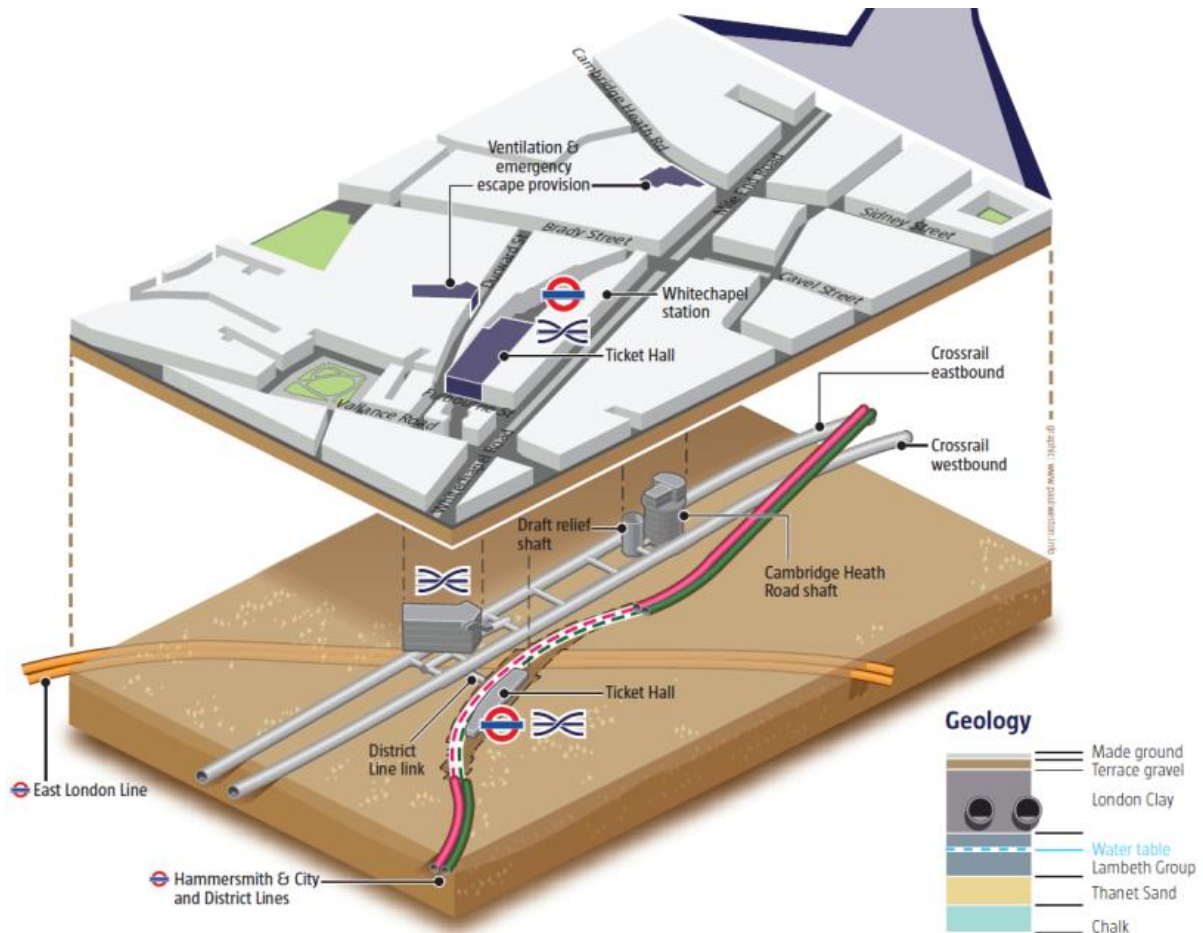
The Whitechapel site. (Source: New Civil Engineer (2009)).
